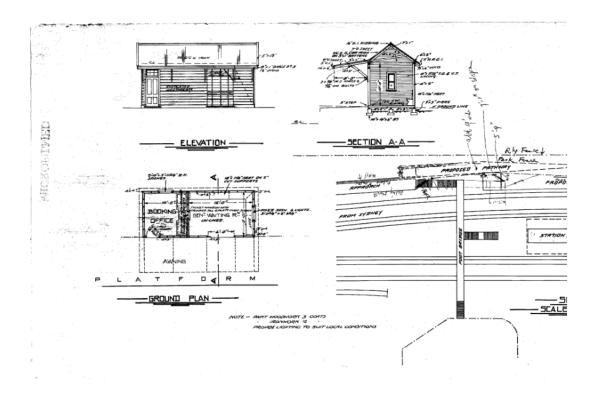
Building diagram for former North Strathfield Platform 3 booking office (Source Sydney Trains Plan Room)
